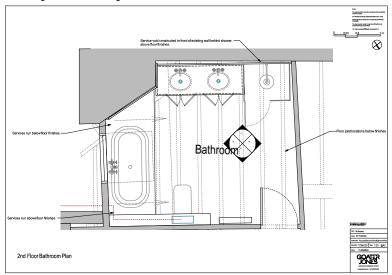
Approved Drawing of floor plan to 2nd floor bathroom in Room S4 from application to 09/0292/DD01 (2018) by Goater Jones Architects showing service wall to party wall
